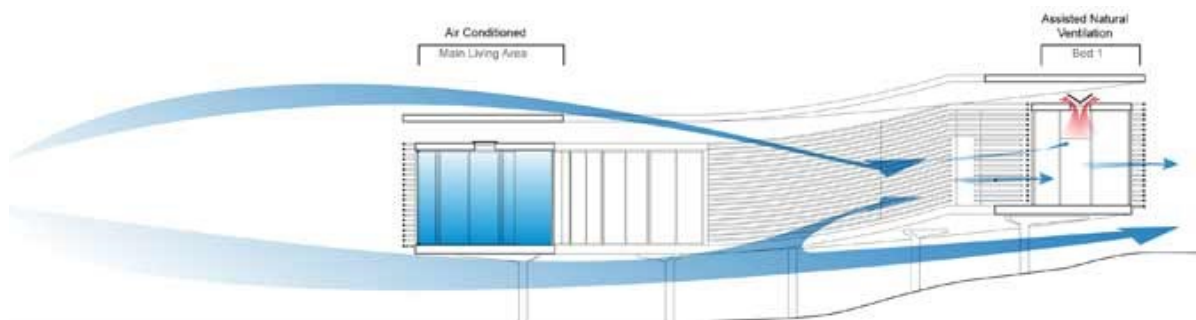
Natural ventilation strategies. *Blue*: Ventilation through the concave envelopes and below the stilts. *Red*: Exhaust air fans and interstitial roof ventilation (Zoka Zola, 2007).
